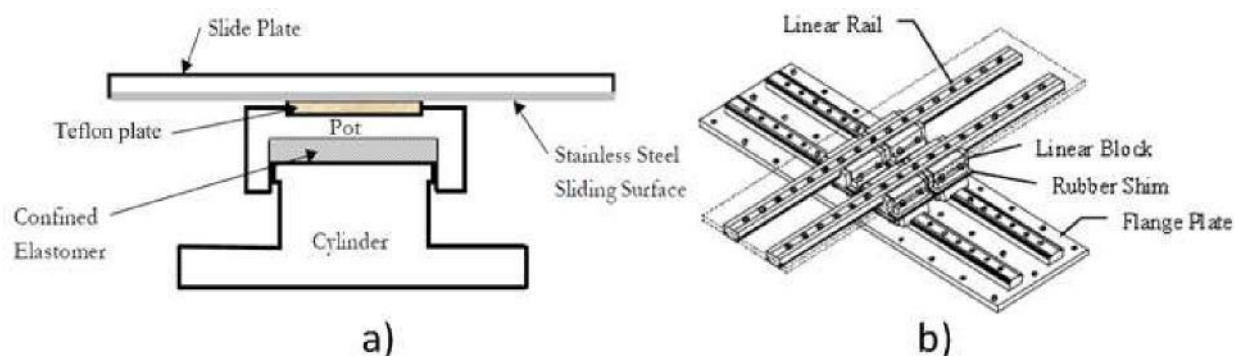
Horizontal sliding bearings: a) pot bearing, b) rail roller bearing
